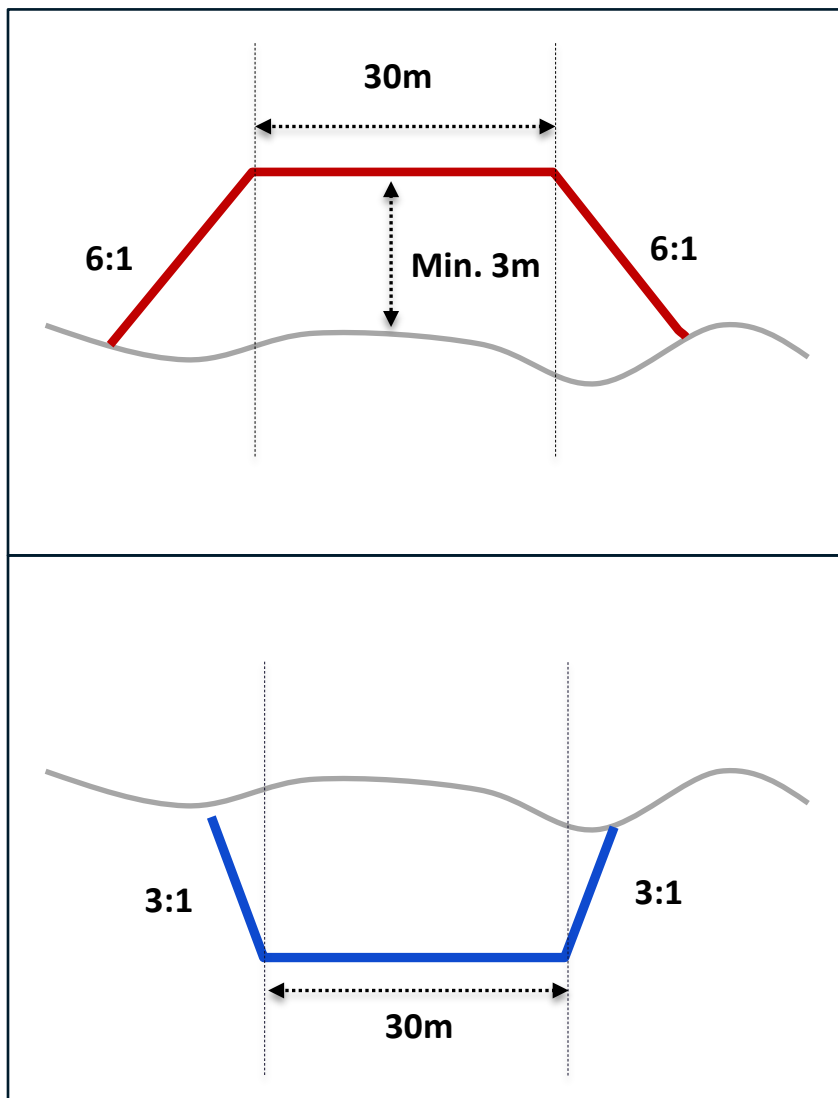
Road design in cross-section when placing above current topography (top) and excavating below current topography (bottom)
